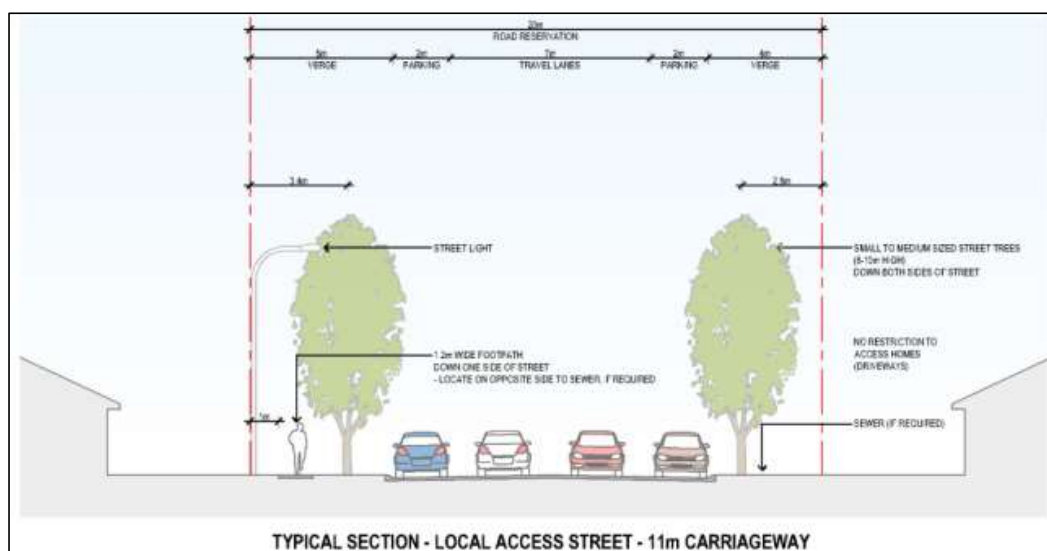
Typical Street Sections – Local Access Street (11m carriageway)
